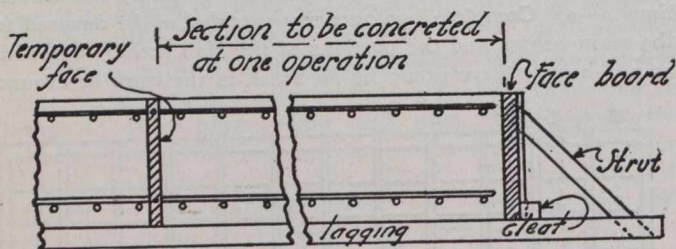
Use of Temporary Board Facing in Longitudinal Concreting of Arch.
